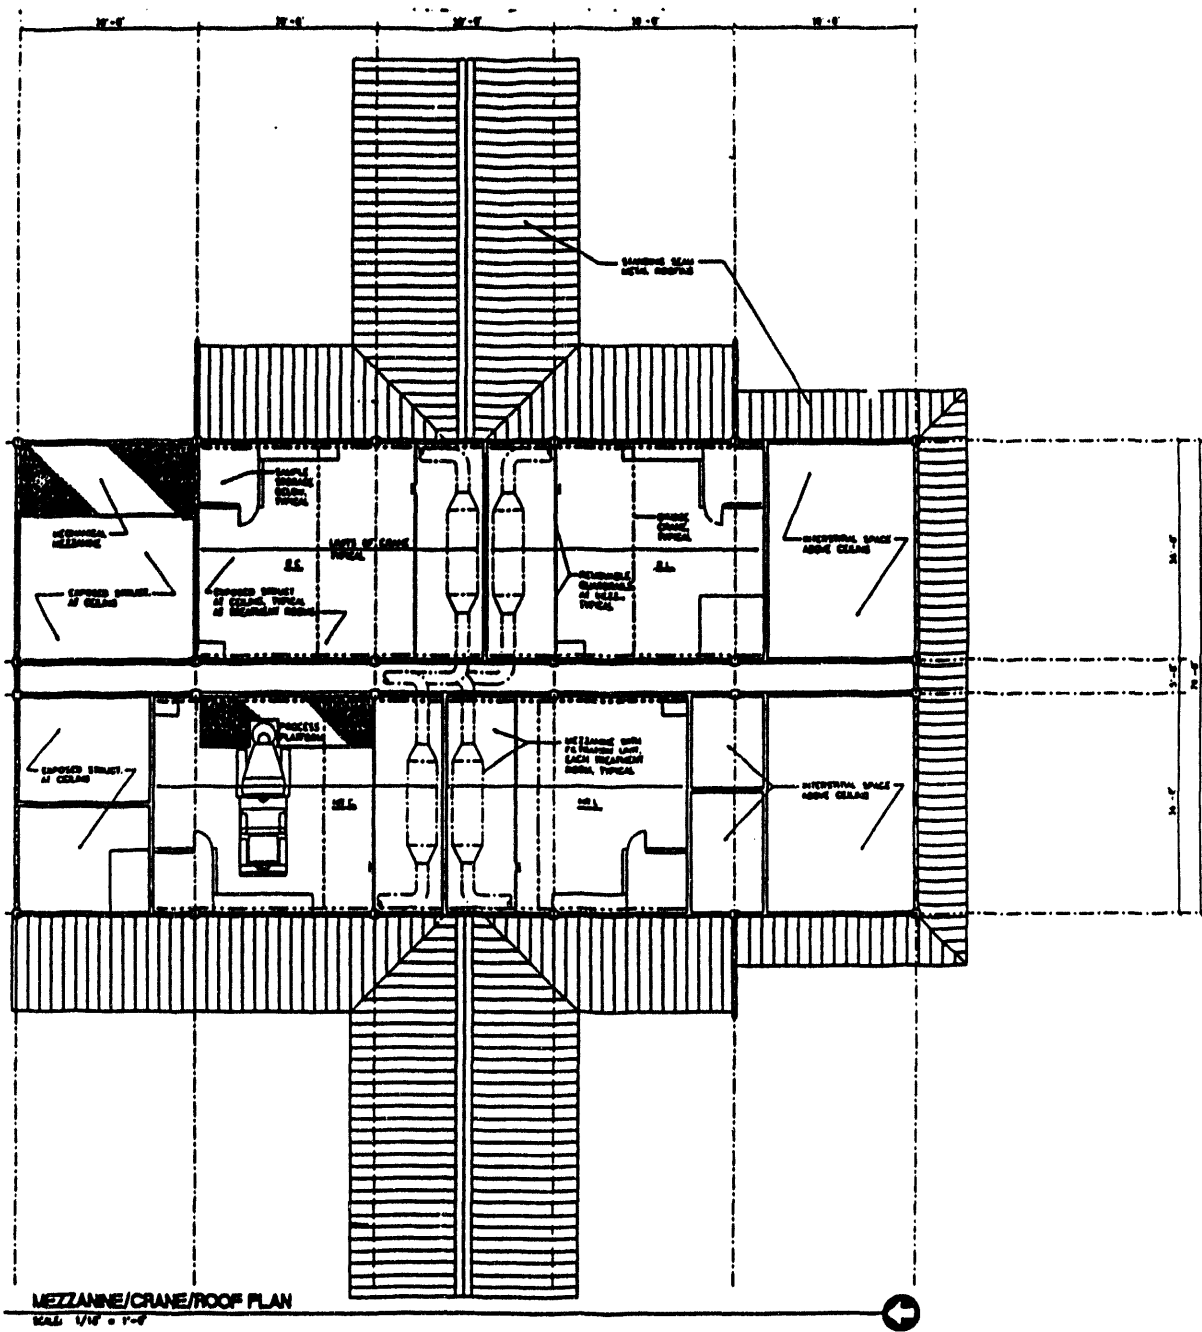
Hazardous Waste Treatment Facility mezzanine/crane/floor plan.
